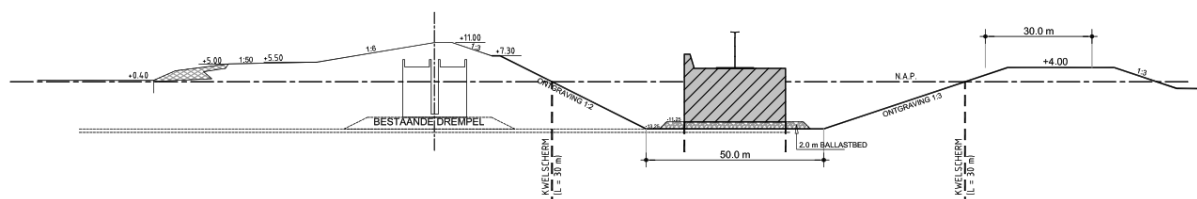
Example of a 'build in the dry' construction method (Mooyaart & van den Noortgaete, 2010).
